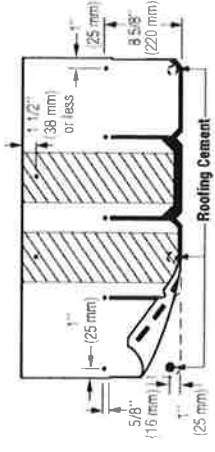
When installing Grand Manor Shangles on steep slopes, use seven nails and three spots of asphalt roofing cement.
